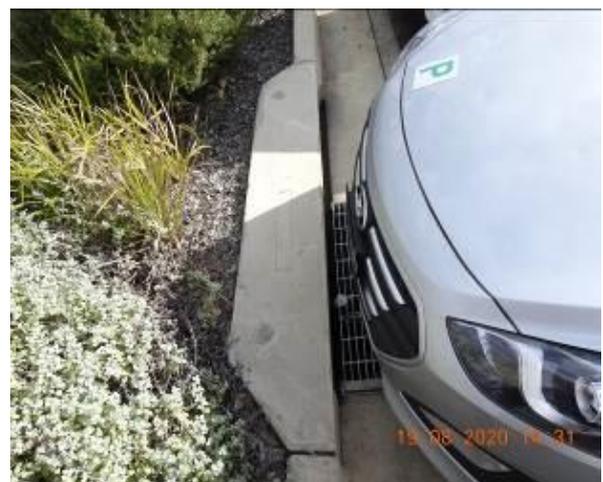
General condition of kerb inlet pit and stormwater inlet pit
